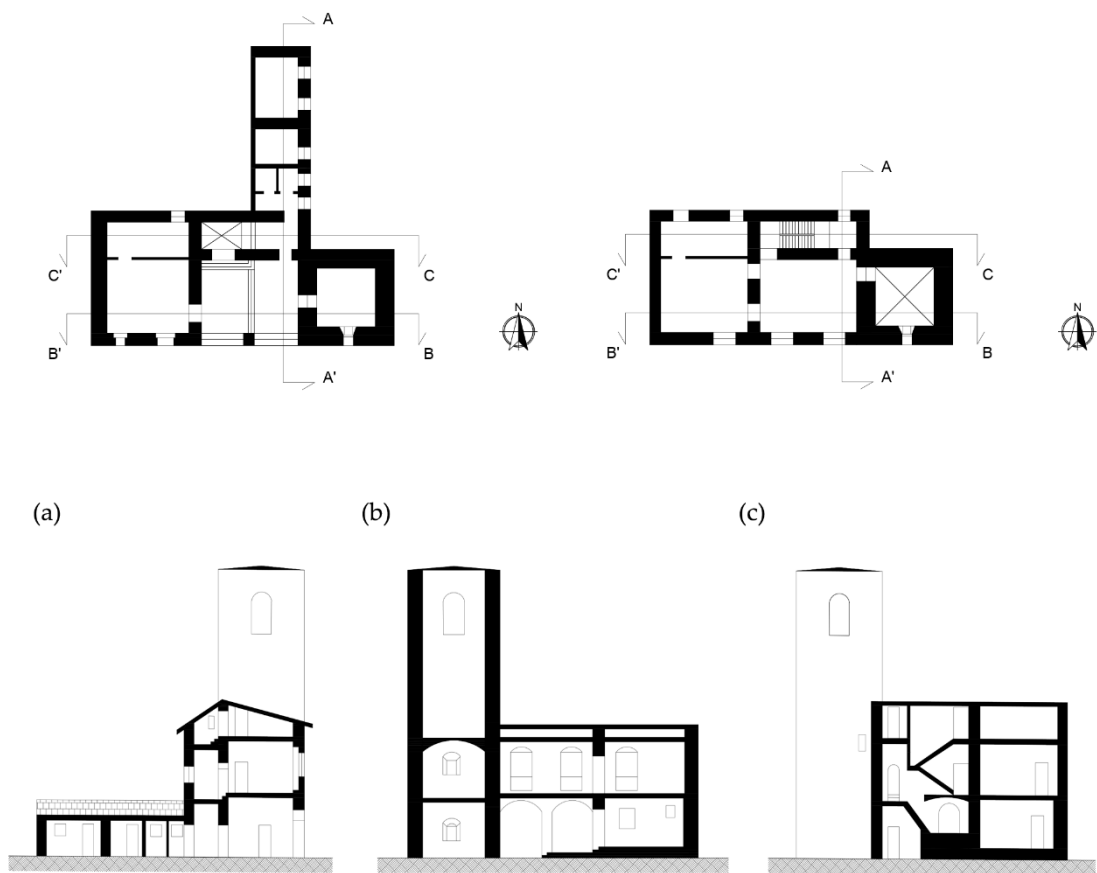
Section A-A'(a), section B-B'(b), section C-C'(c) of the Civic Tower and the Palace.
